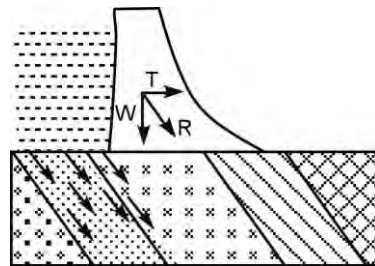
Dam resting on beds exhibiting steep downstream slope
